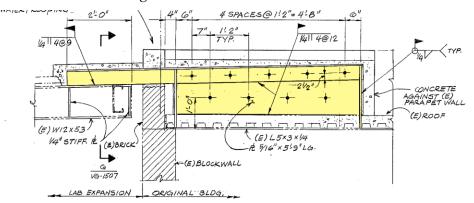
Connection of the West Lab Addition to the Original Lab Building
